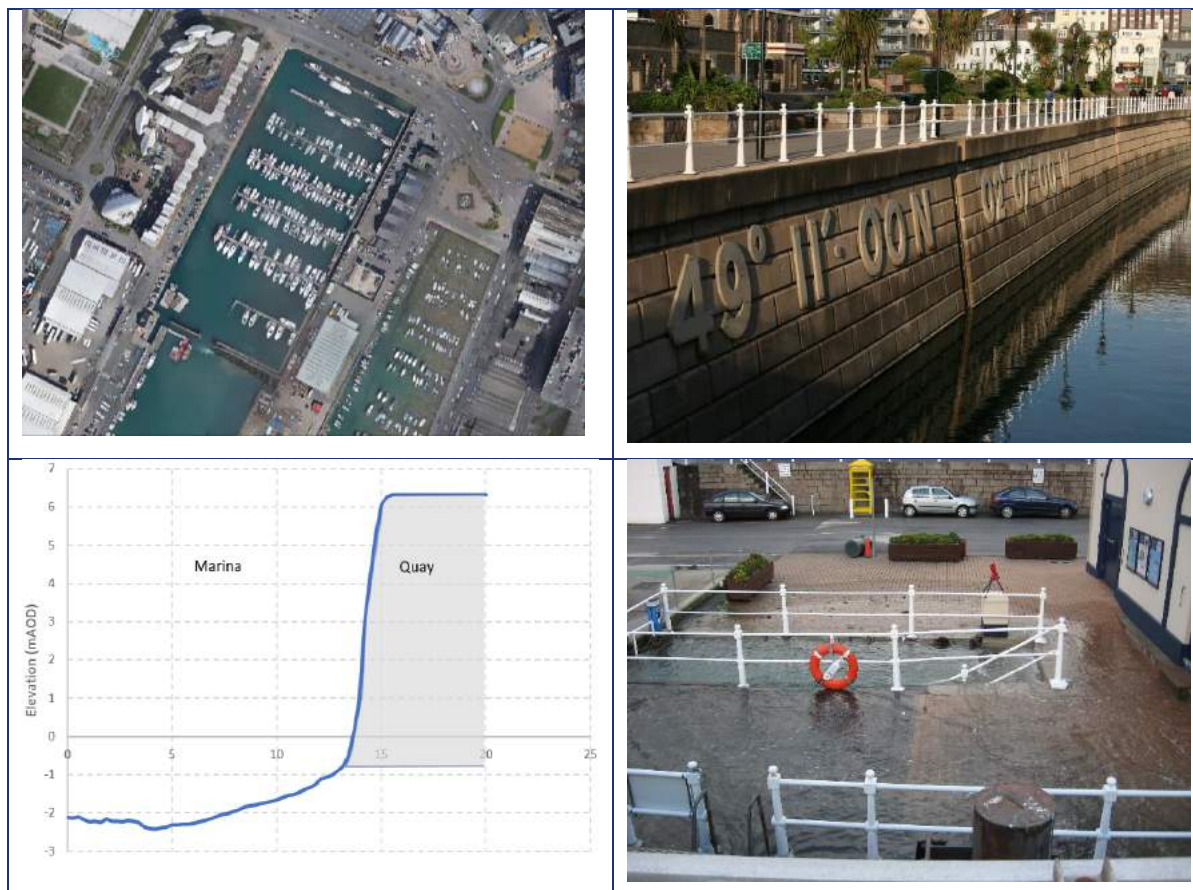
Structure and overtopping evidence at Structure 5: Harbour quay and walls
